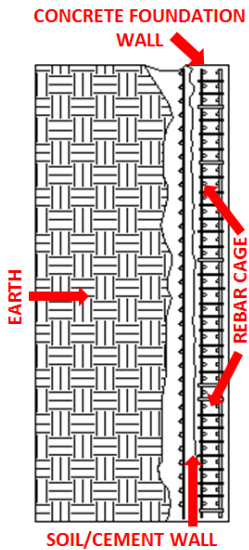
The above wall section shows the relationship between the soil-cement shoring wall and the building's foundation wall.
